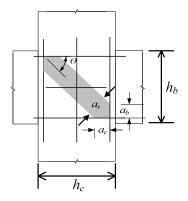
Concrete compression softening phenomenon in beam-column joints
